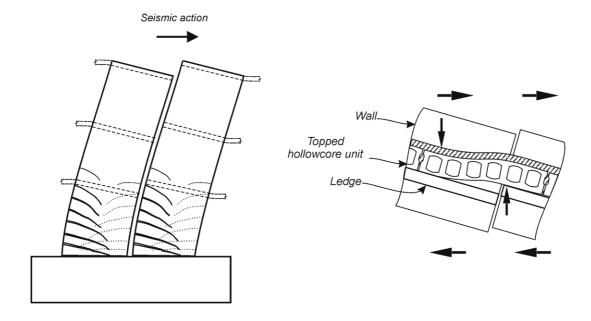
Mechanisms of non-linear deformation in precast concrete wall systems
